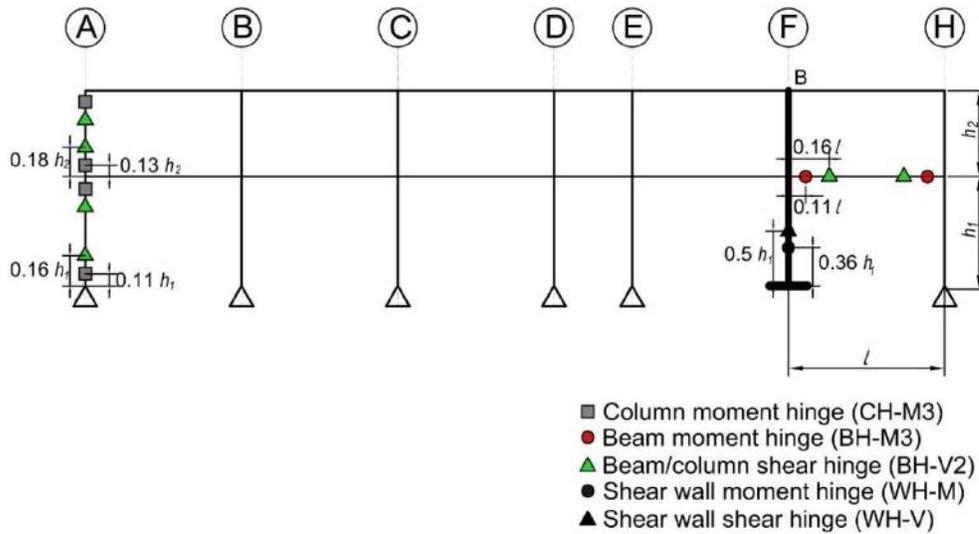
Frame 1 model showing plastic hinge locations (RS3).
